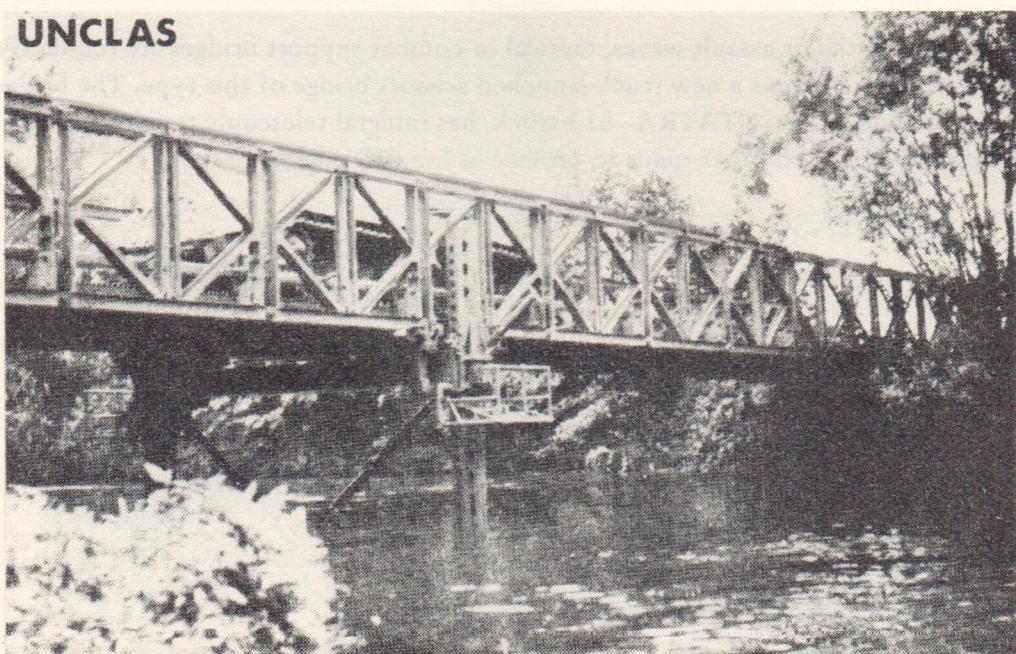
MS Medium Truss Bridge with Intermediate Pier
